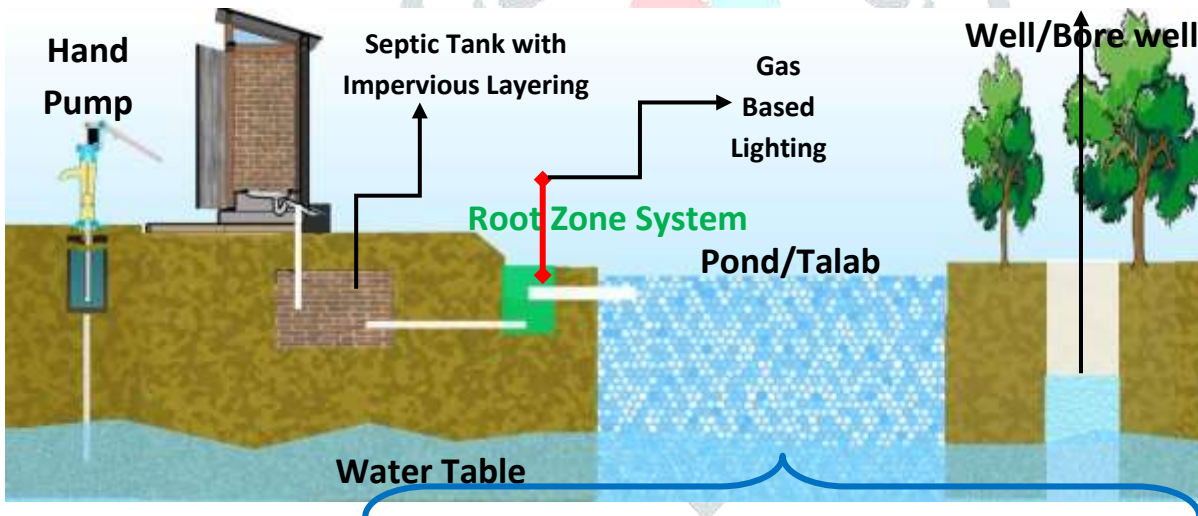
New Pattern of Rural Settlement with Root Zone System & Water Pond (Author, n.d.)
